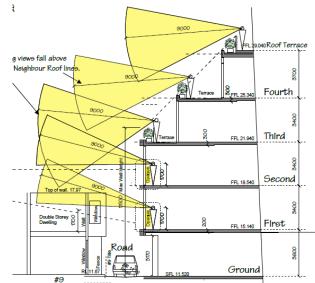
Section illustrating mitigation of overlooking into No. 9 Belgravia Street (Application material)
